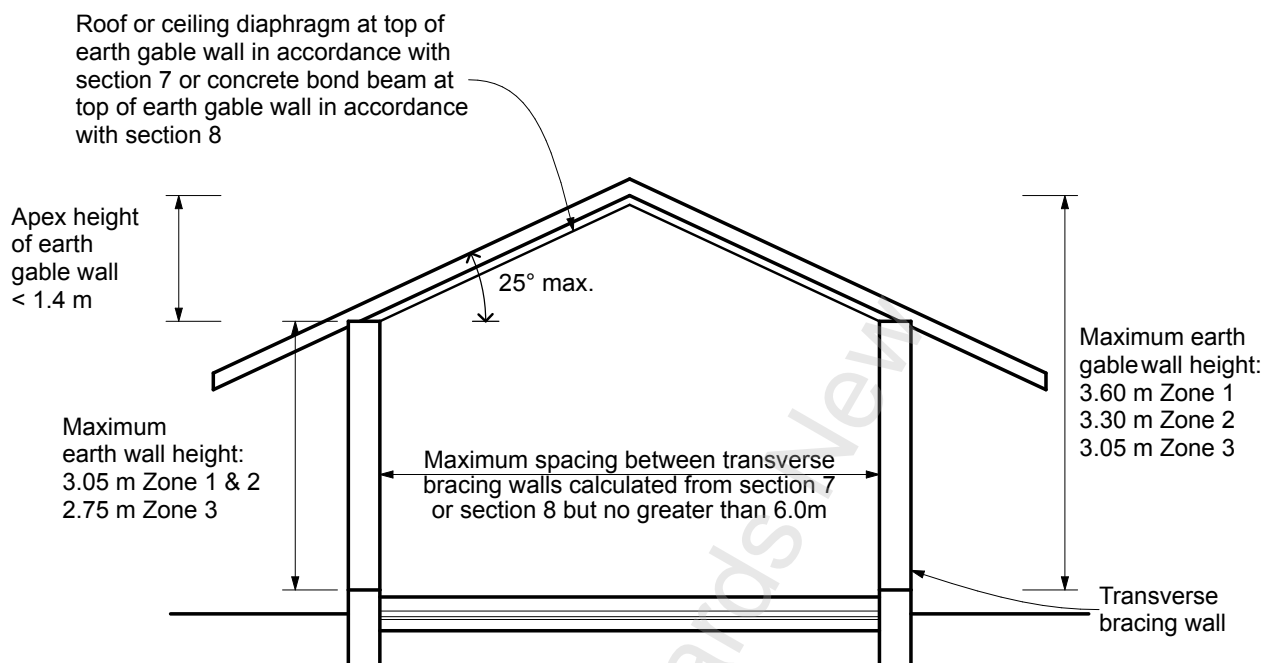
Roof or ceiling diaphragm or concrete bond beam at top of earth gable wall and apex height of earth gable wall < 1.4 m
